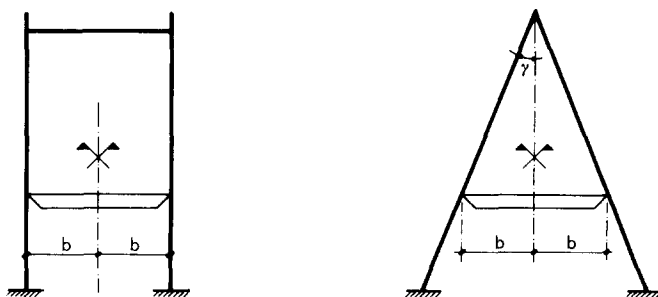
(a) H-shaped tower, (b) A-shaped tower.
